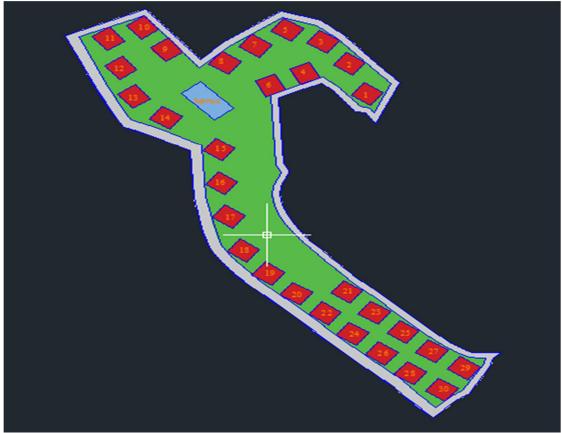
For Suggestion Plan Notes, Architectural Building Layout
